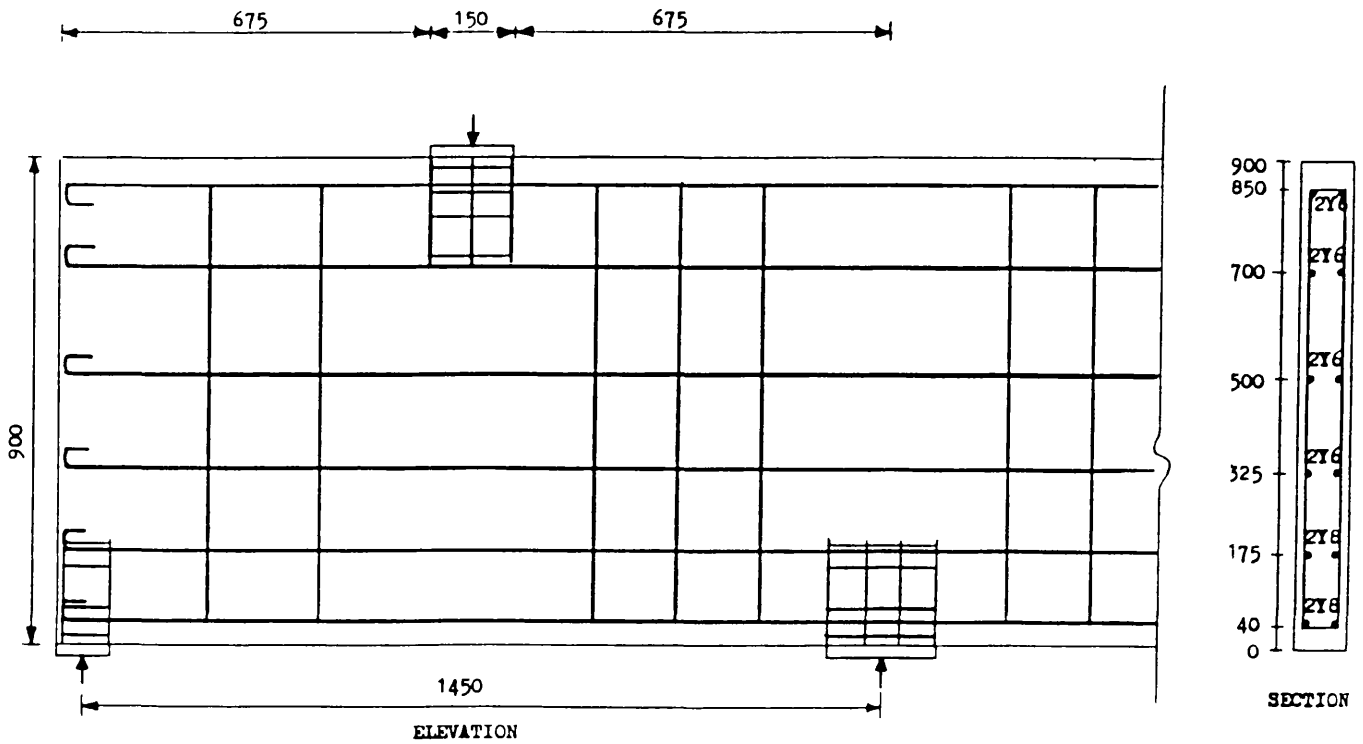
Dimensions and reinforcing details of girder TRGRAS4
